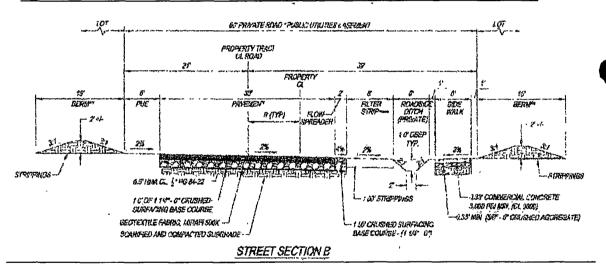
B. Street Section B: Water Quality Filter Strip with Private Road Section
